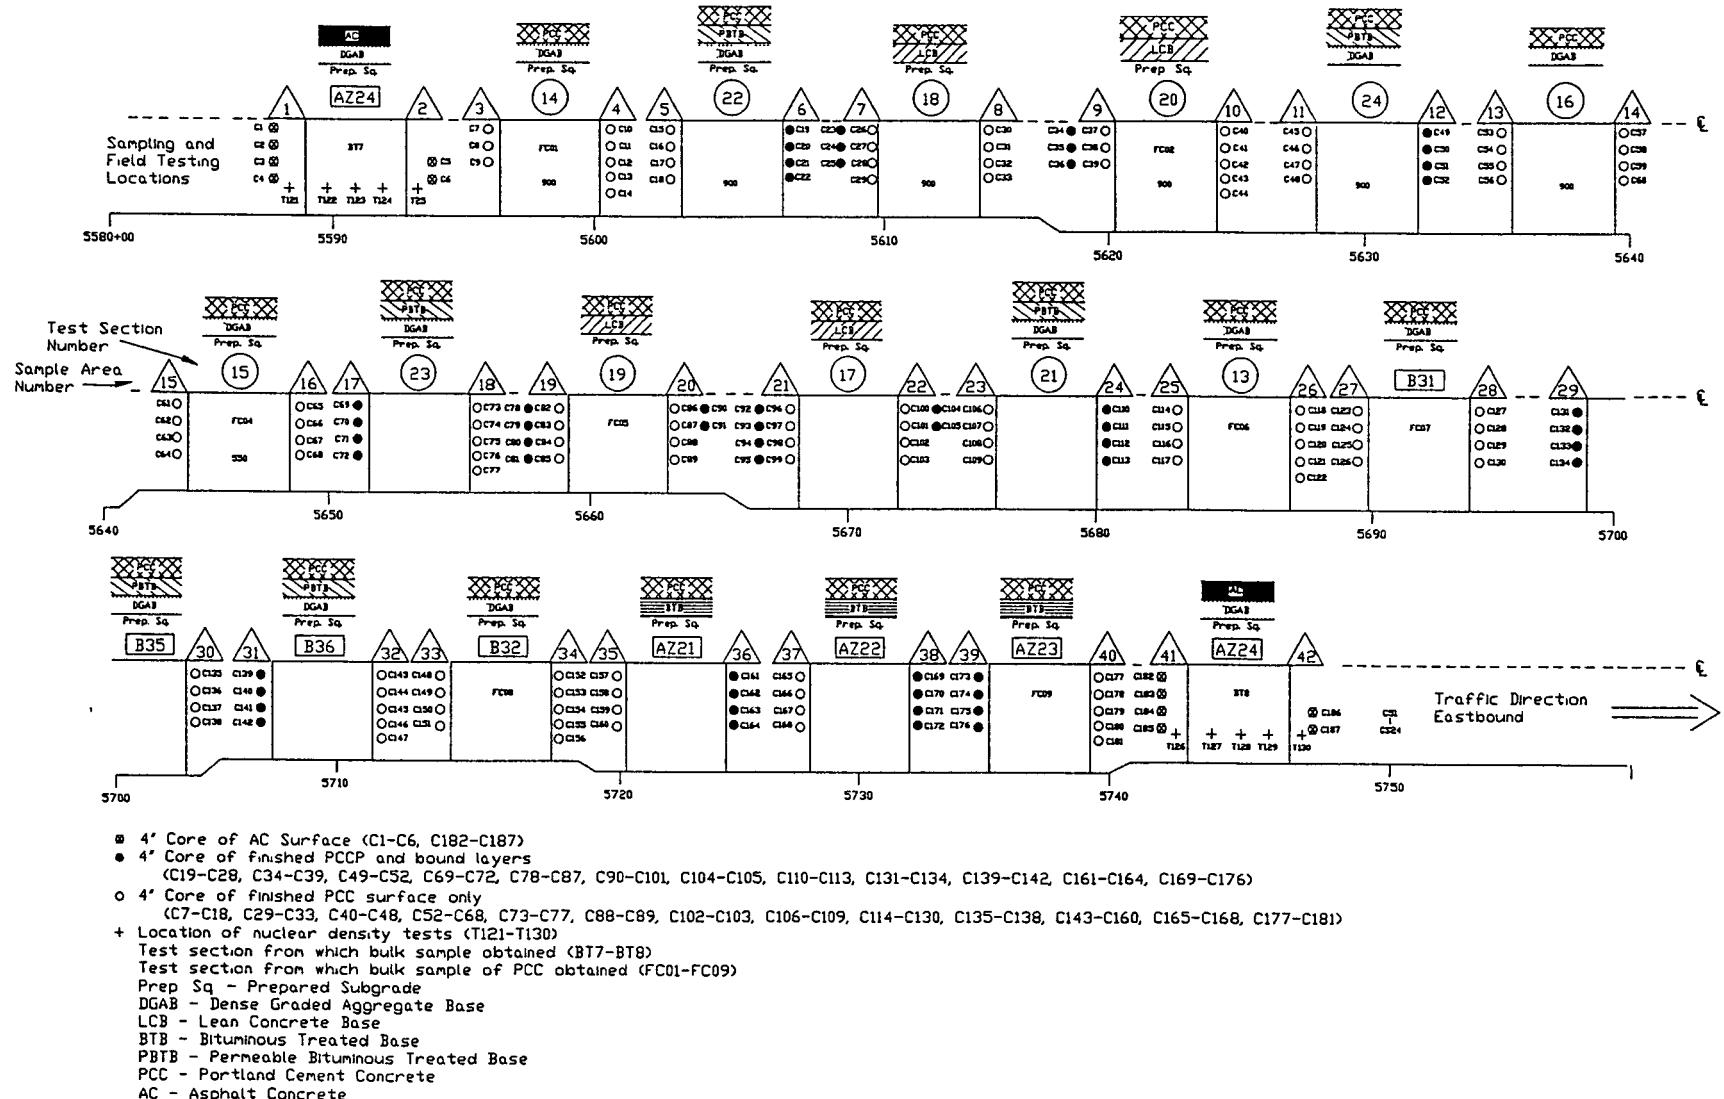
Overview of sampling, testing, and coring plan for surface of test sections on SPS-2 Arizona project.
